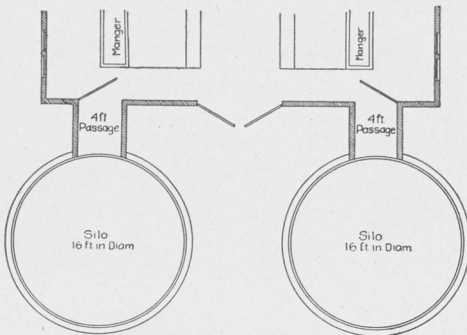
Plan of Silos and End of Dairy Barn Showing a Convenient Arrangement.
